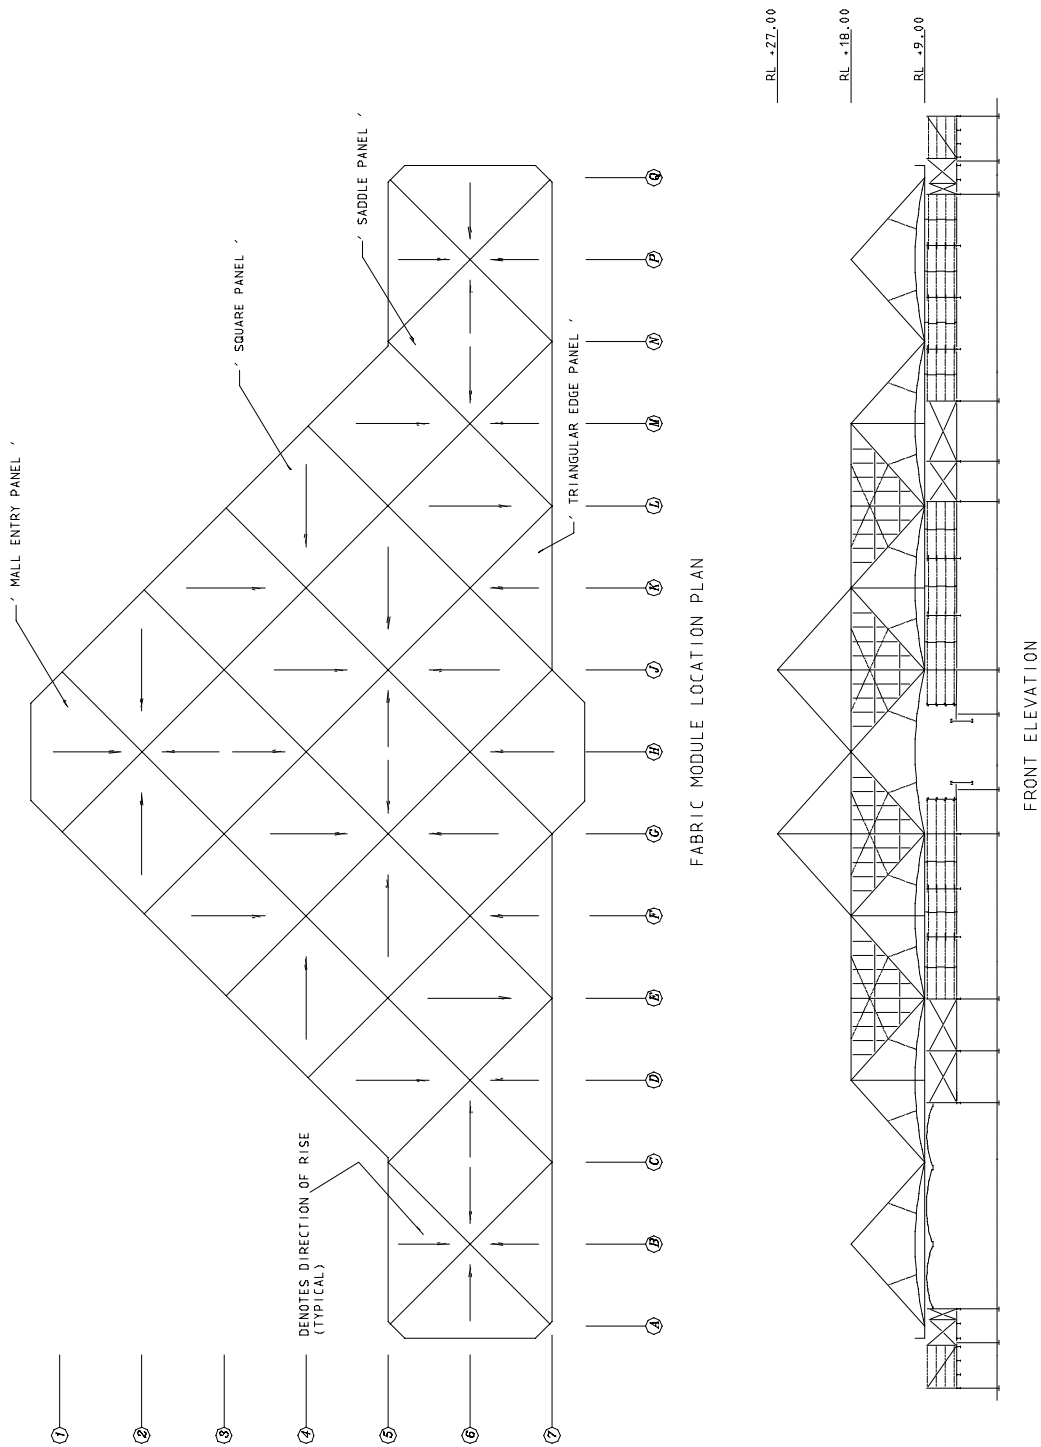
Lakeside Joondalup Shopping Centre Great Space Roof Structure
